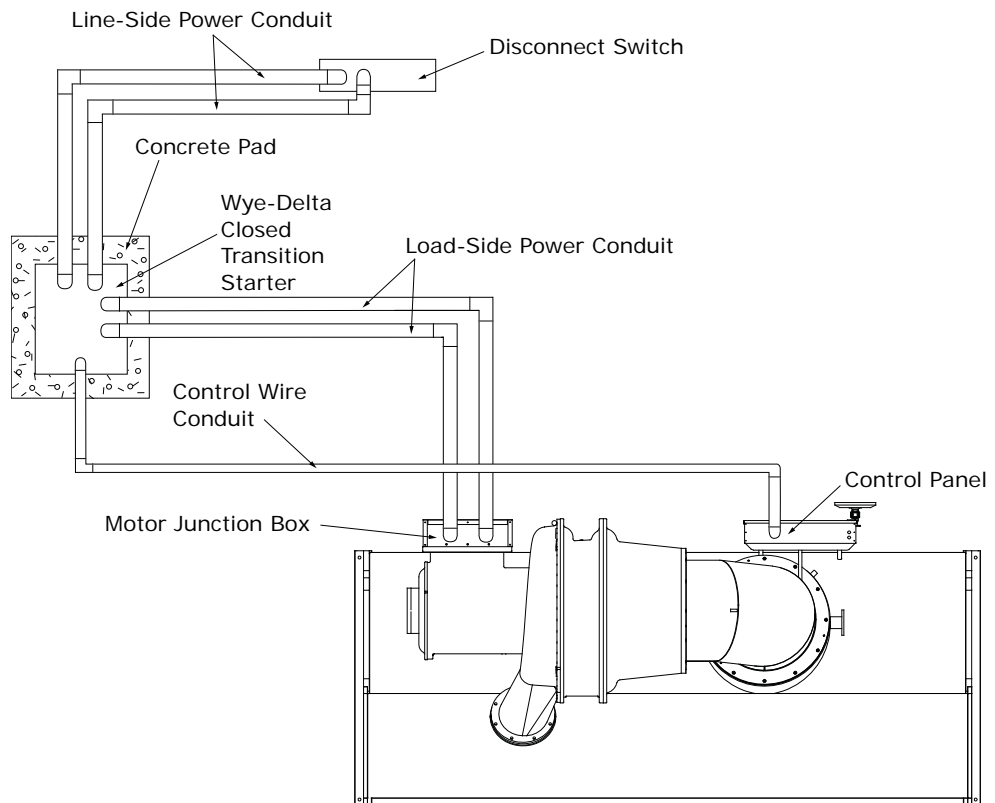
Typical equipment room layout: conventional remote Wye-Delta starter
